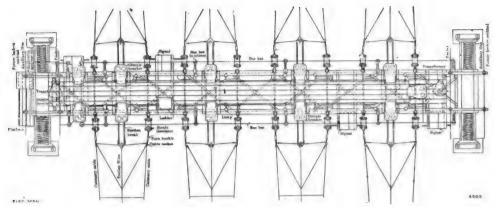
PLAN OF FOUR-TRACK ANCHOR BRIDGE.
